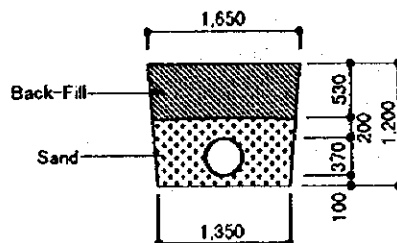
Typical Sectional Plan for the Intake Pipe
